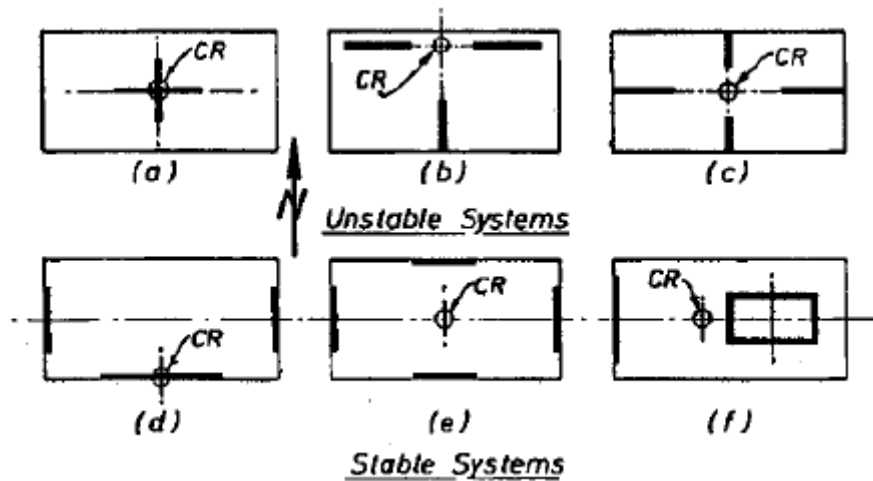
Examples for torsional stability of wall systems (source: Paulay and Priestley, 1992)
